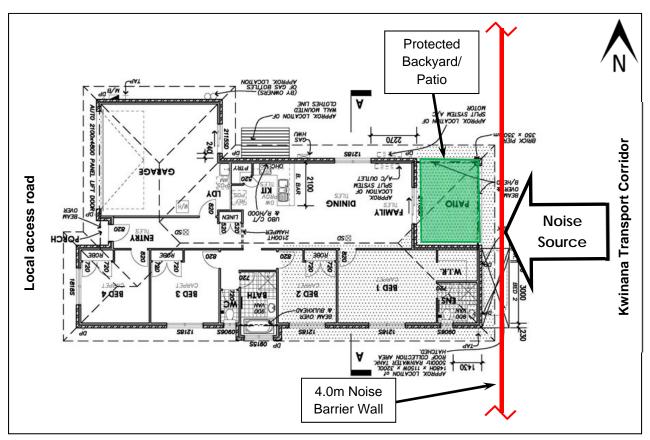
Outdoor Living Area behind Noise Barrier Wall
